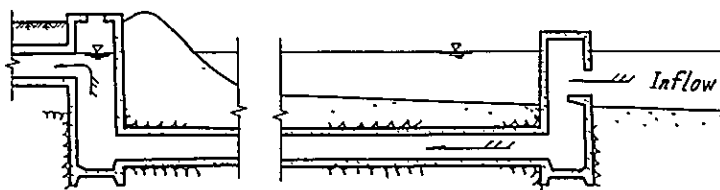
·3·14 Standard Cross Section of Pipe Intake (No. 1)
